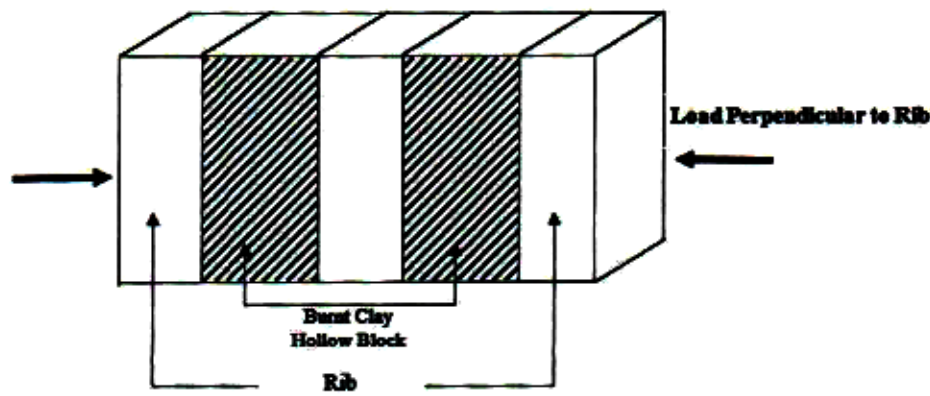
Loading arrangement of a Hollow Block Slab Perpendicular to the Rib
